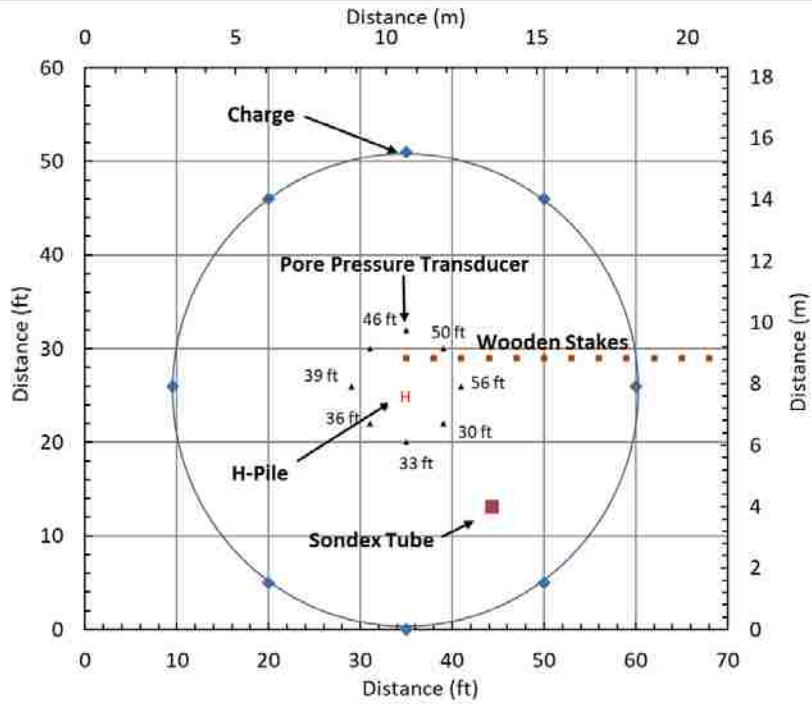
Detailed plan view drawing of the H-pile with blast holes and instrumentation.
